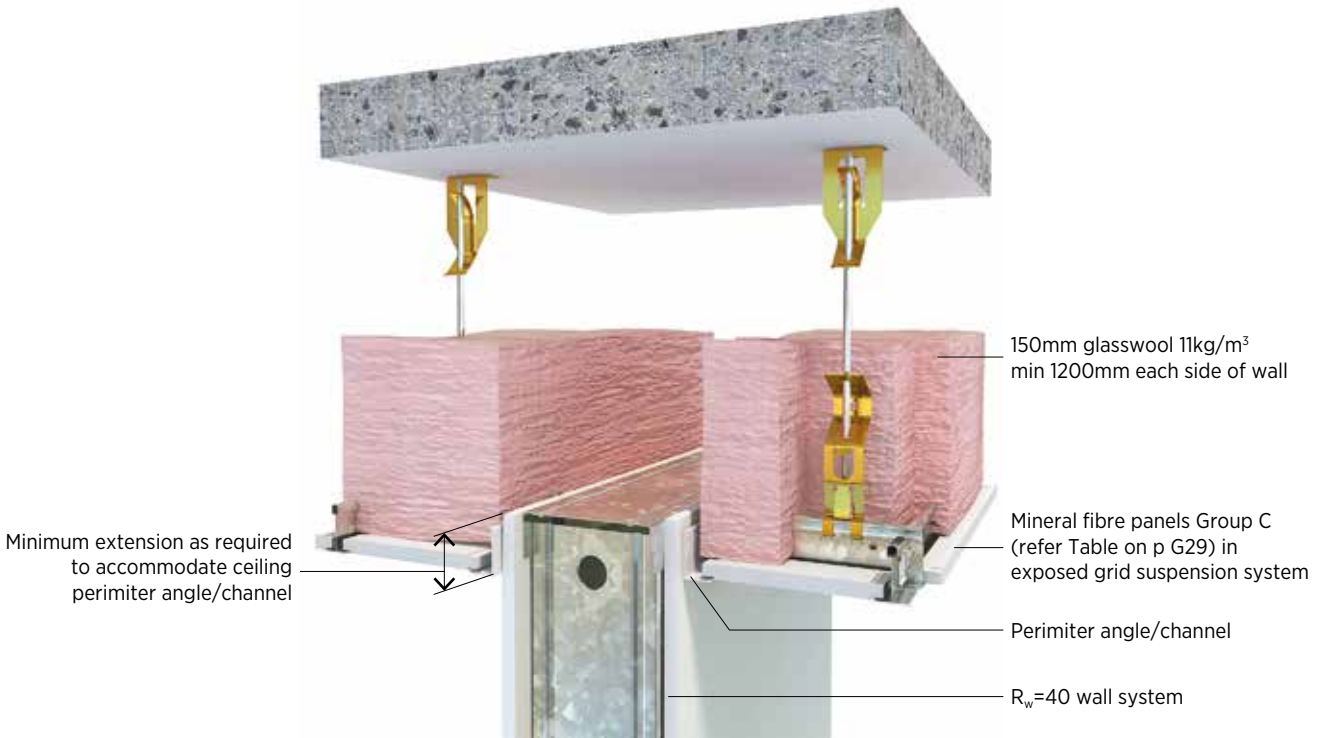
Ceiling configuration to maintain an $R_w = 40$ wall acoustic rating (System OP.4 shown)
